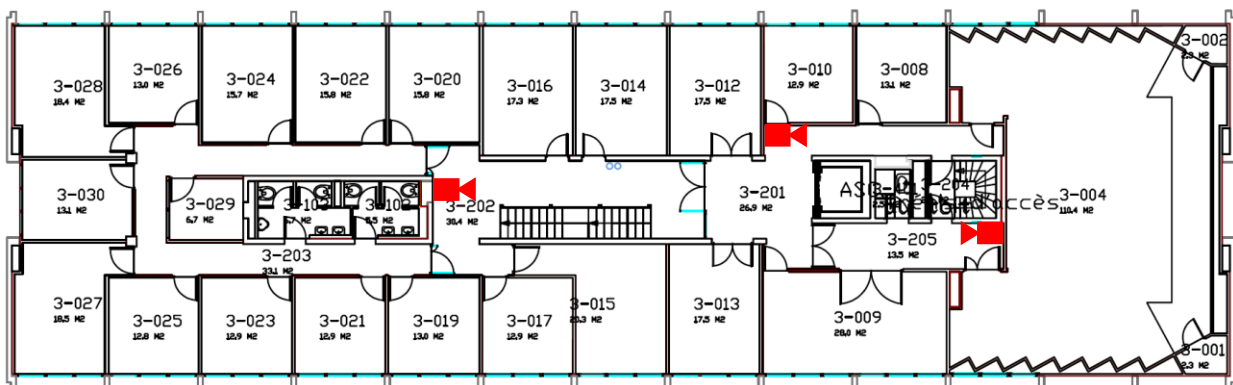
floor R+3 layout as well as the locations and orientations of cameras within this floor
